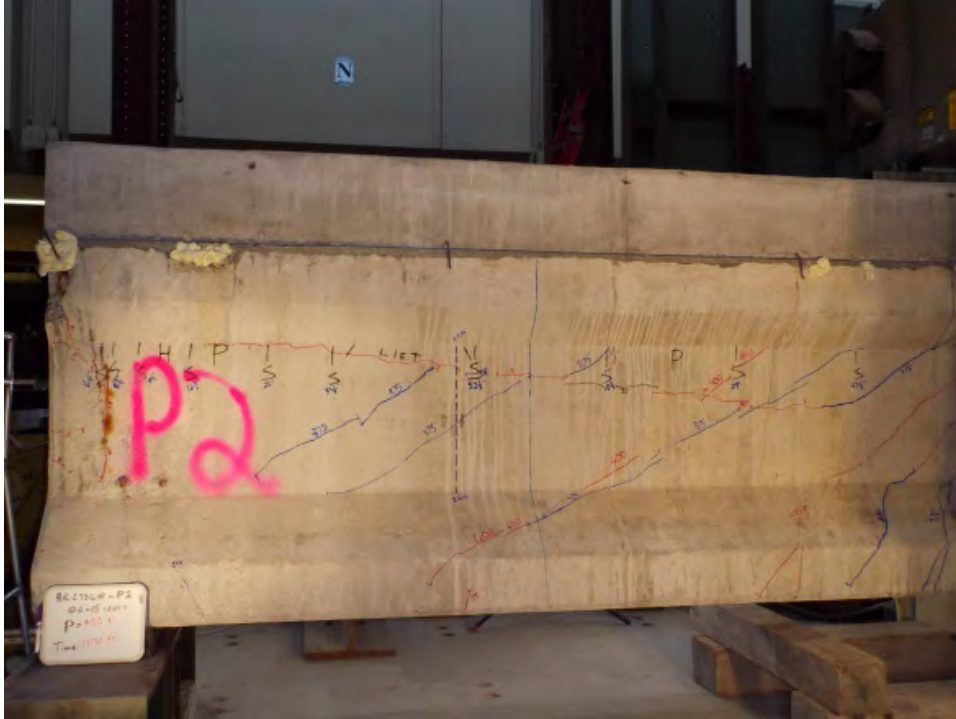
Girder P2 last load pause before failure, P=400k
